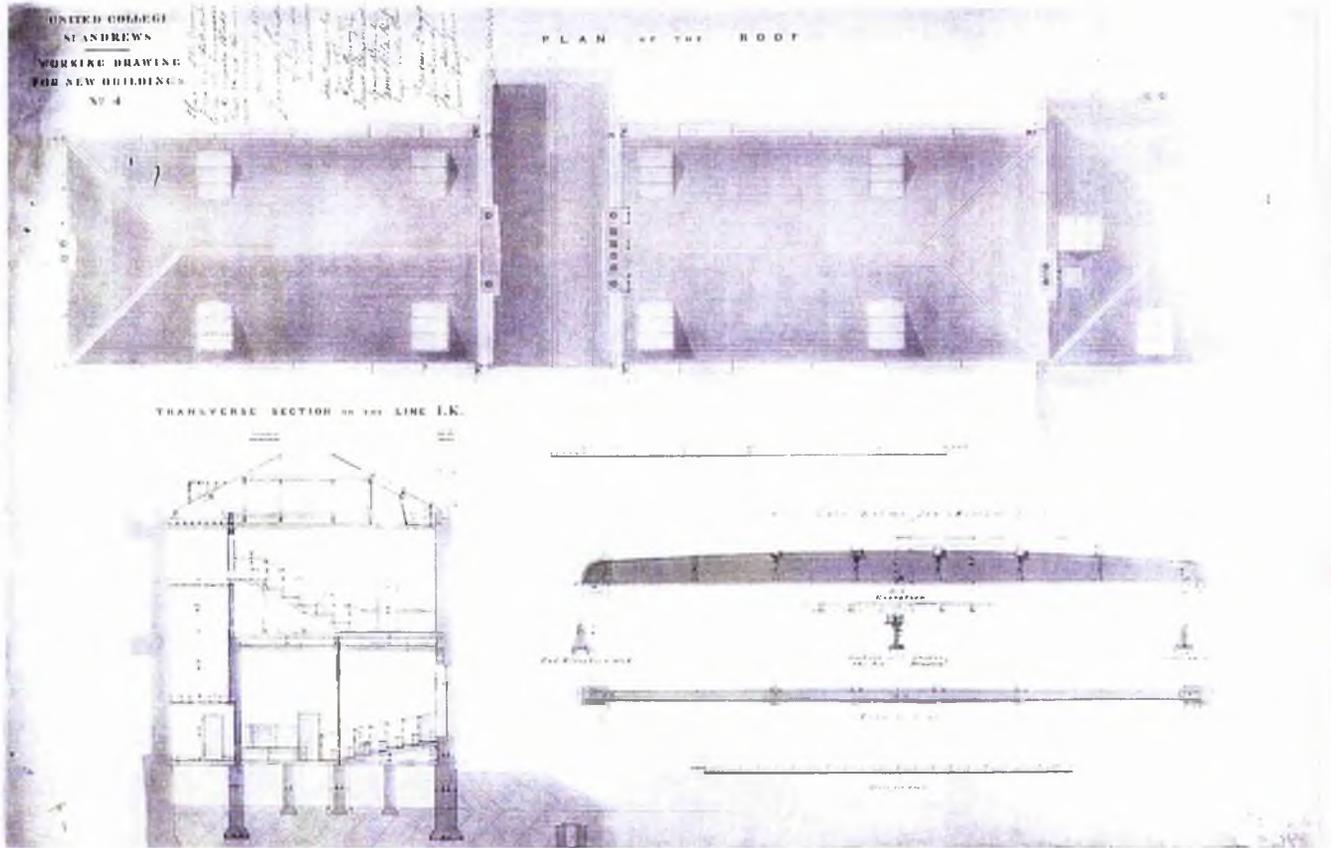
United College. Roof plan, section of north building and detail of cast iron beams, working drawing No4. W. Nixon, February, 1845.
